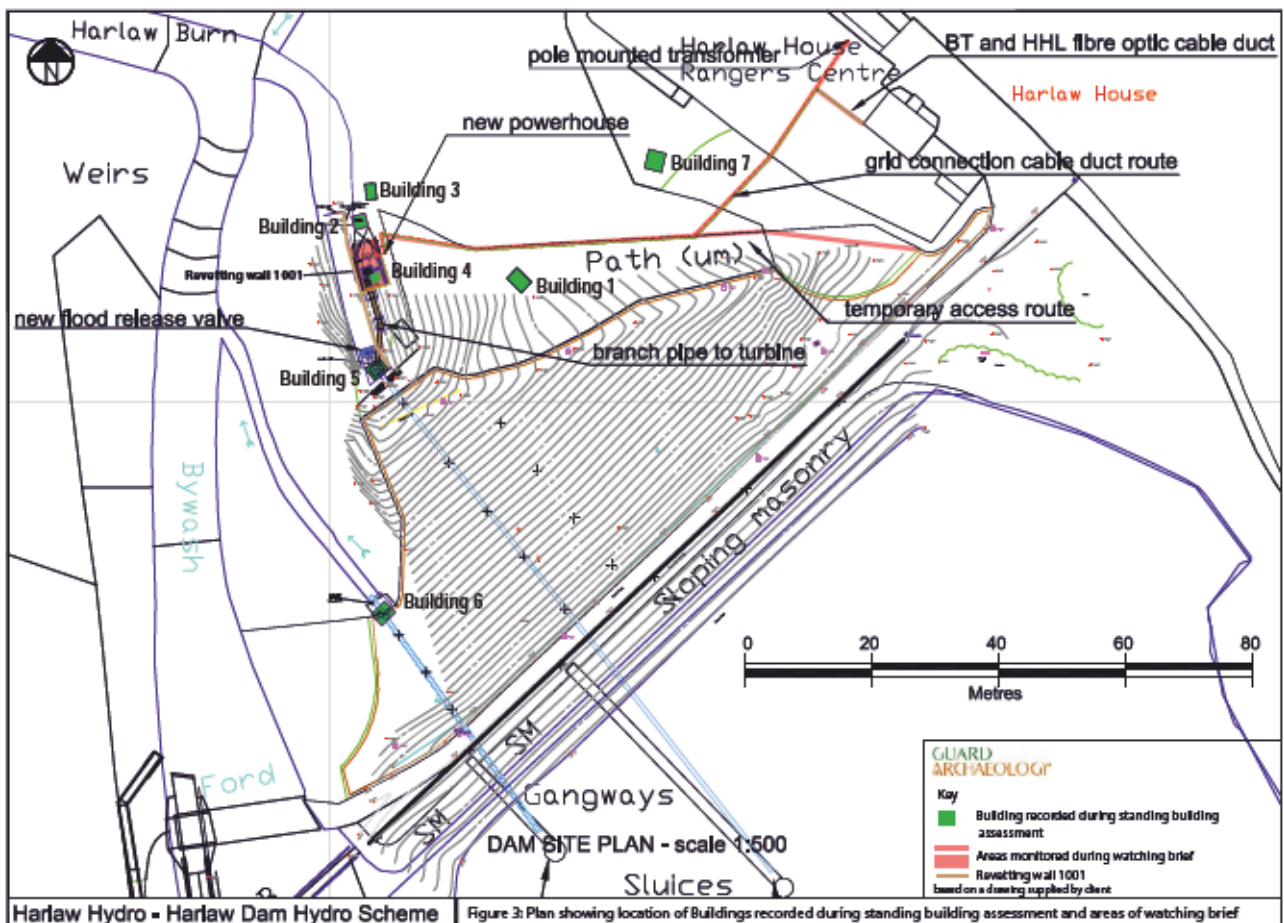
Plan showing location of Buildings recorded during standing building assessment and areas of watching brief
